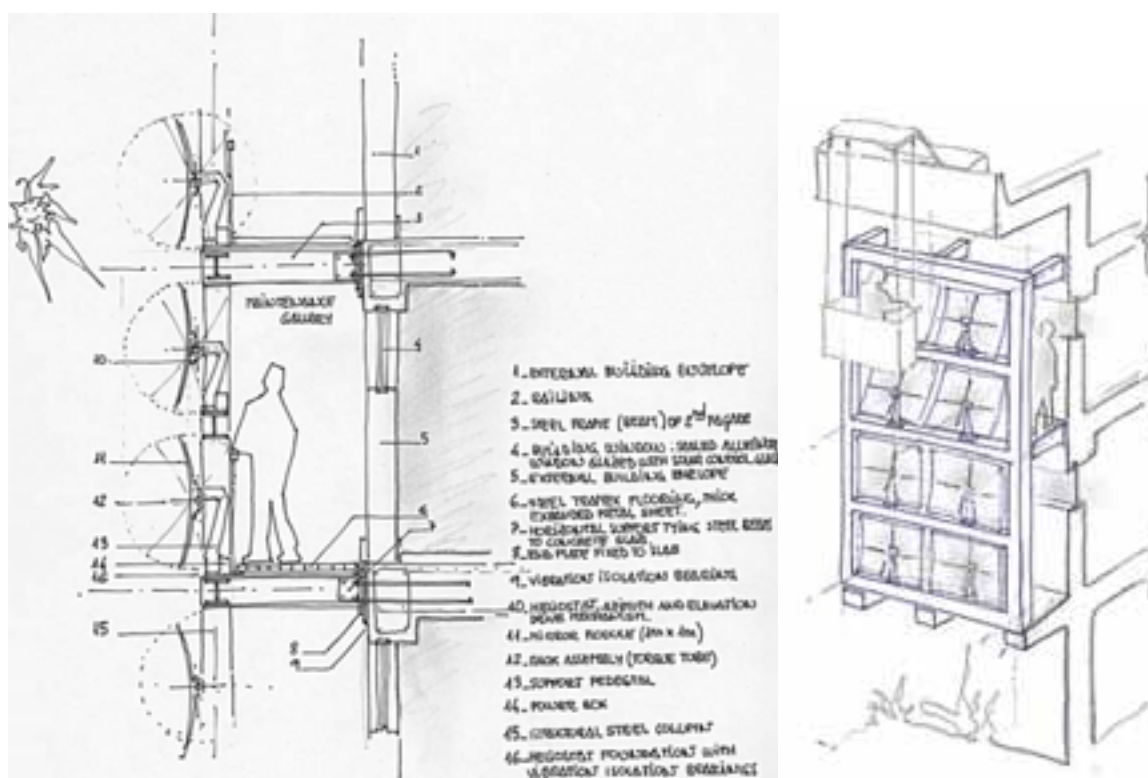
1<sup>st</sup> concept of CSP system integration in building. (Left) Typical cross façade section; (right) Steel frame structure.
